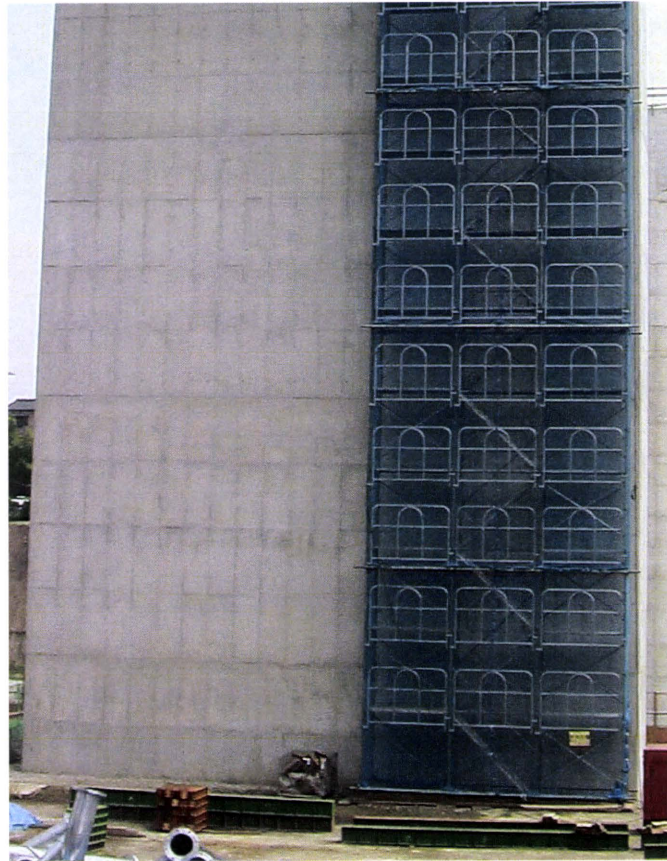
Prefabricated scaffolds constructed by guardrail-first erection method.
